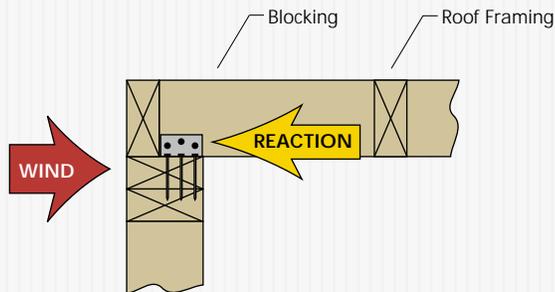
Rafter connection detail – transfers forces into diaphragm
